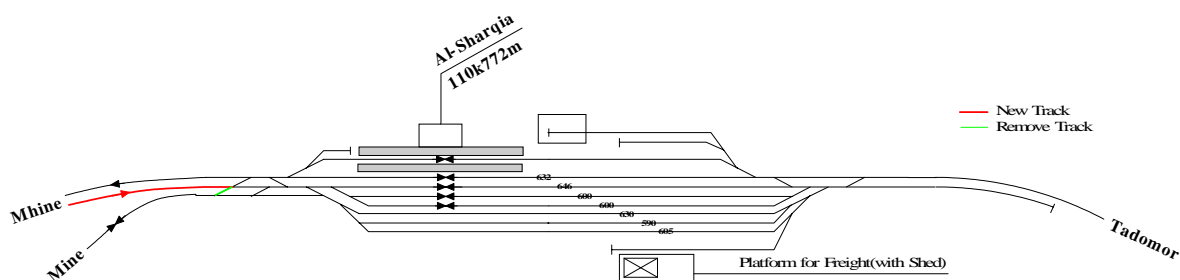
Sketch Al-Sharqia station improvement track layout
